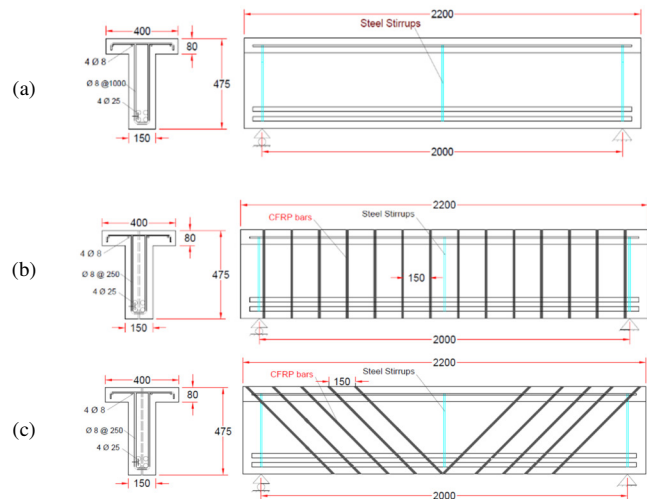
Details of the beams for group two without stirrups (just 3 for support) (all dimensions in mm): (a) Un-strengthened reference beam, (b) strengthened beam with vertical CFRP bars, (c) strengthened beam with inclined CFRP bars.
